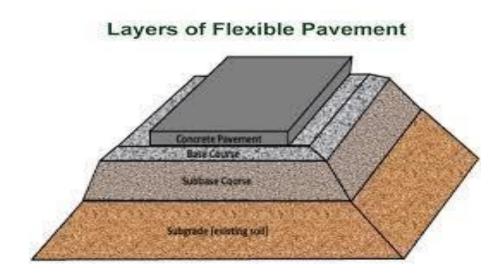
Flexible pavement (Source-www.theconstrutor.org)
